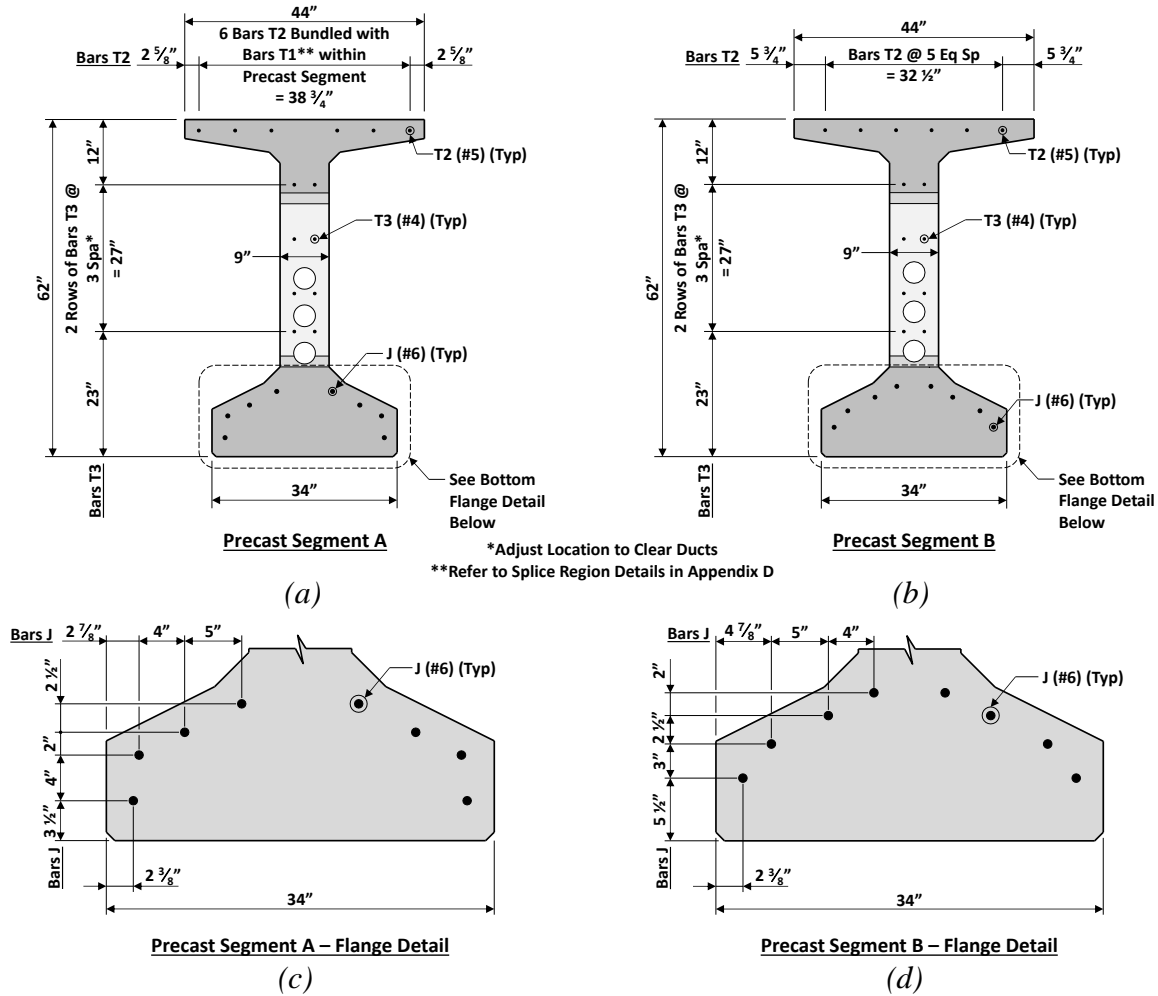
Recommended longitudinal interface reinforcement– (a) end of Precast Segment A; (b) end of Precast Segment B; (c) flange detail of Precast Segment A; (d) flange detail of Precast Segment B
